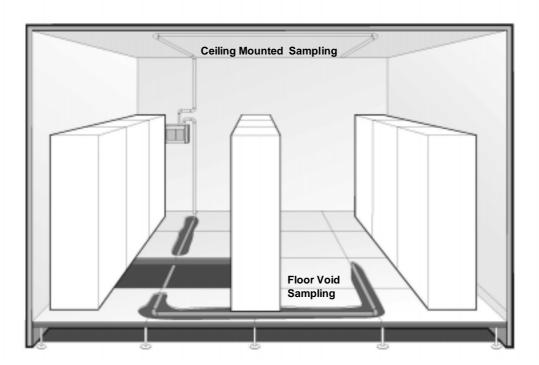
Ceiling Mounted and Floor Void Sampling.
